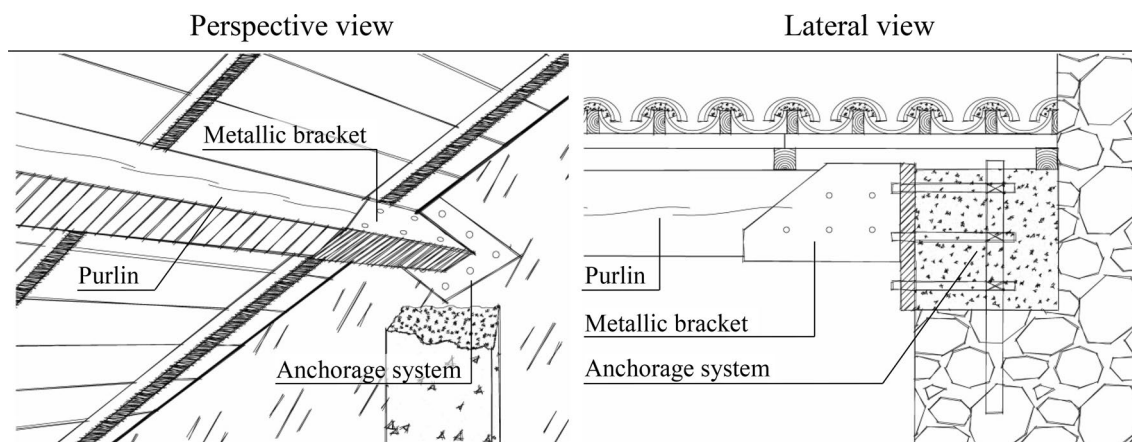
Strengthening of the purlin support with a bracket anchored in the masonry wall
